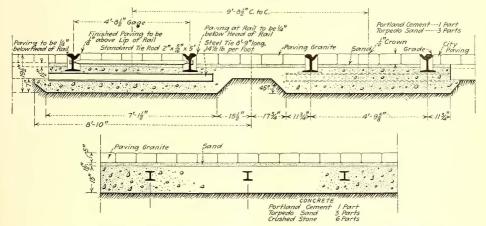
CHICAGO STANDARD TRACK TYPE NO. 1; CONCRETE FOUNDATION AND STEEL TIES NOTE—In accordance with Resolution No. 1251 passed by the Board of Supervising Engineers on June 29, 1909, all new tracks built hereafter, unless otherwise specifically ordered, shall be 10 ft. 2 in. center to center; and all other dimensions on this drawing that will be affected by this increased track center must be changed accordingly.
